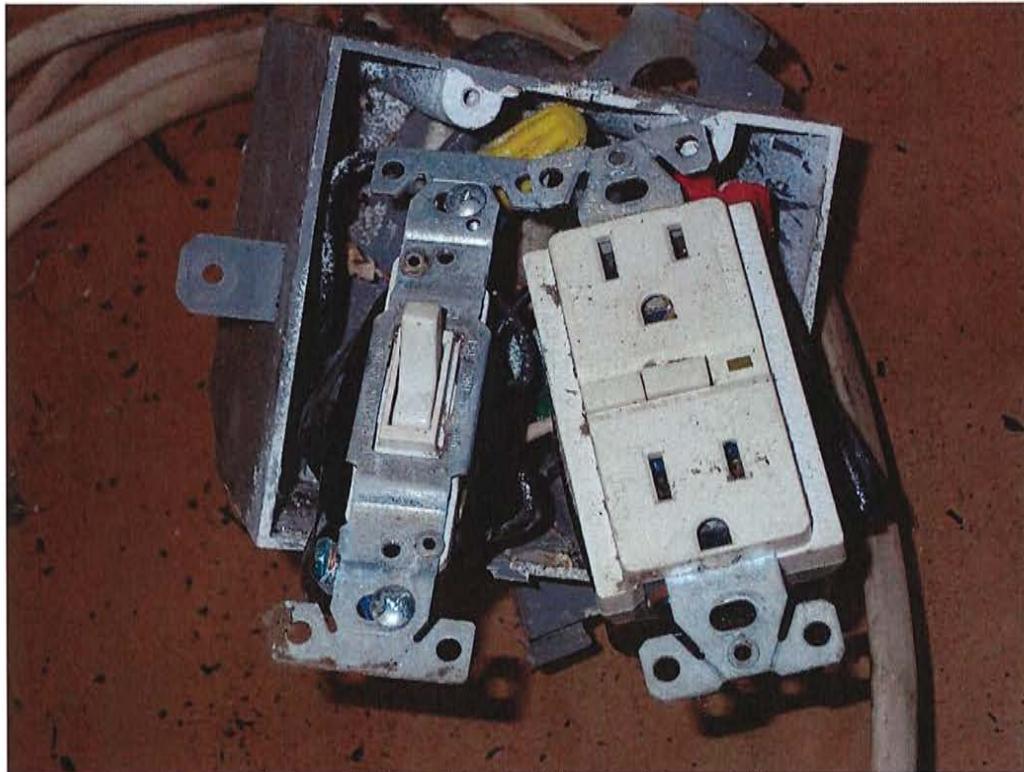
Wiring from 2nd Floor Bathroom Ceiling
